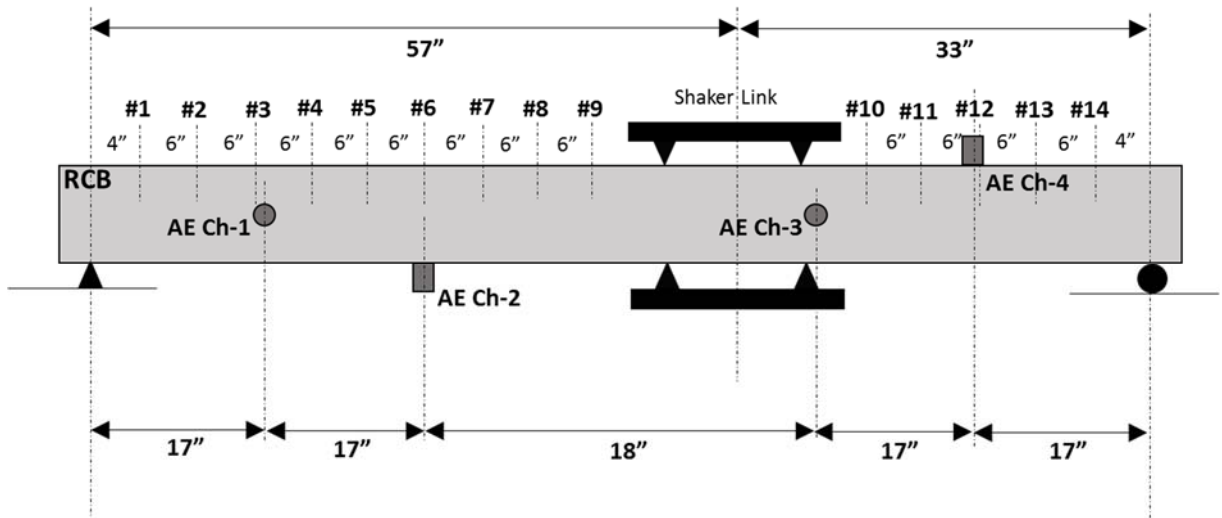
Location of pencil-lead-break stations for reinforced concrete beam.
